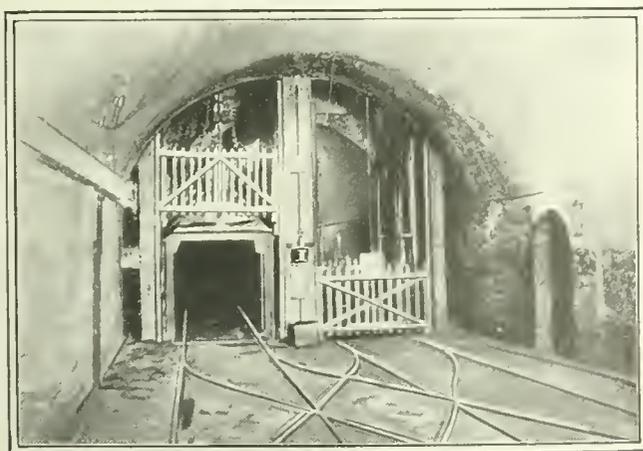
CAGE AT SHAFT BOTTOM, GATE OPEN
